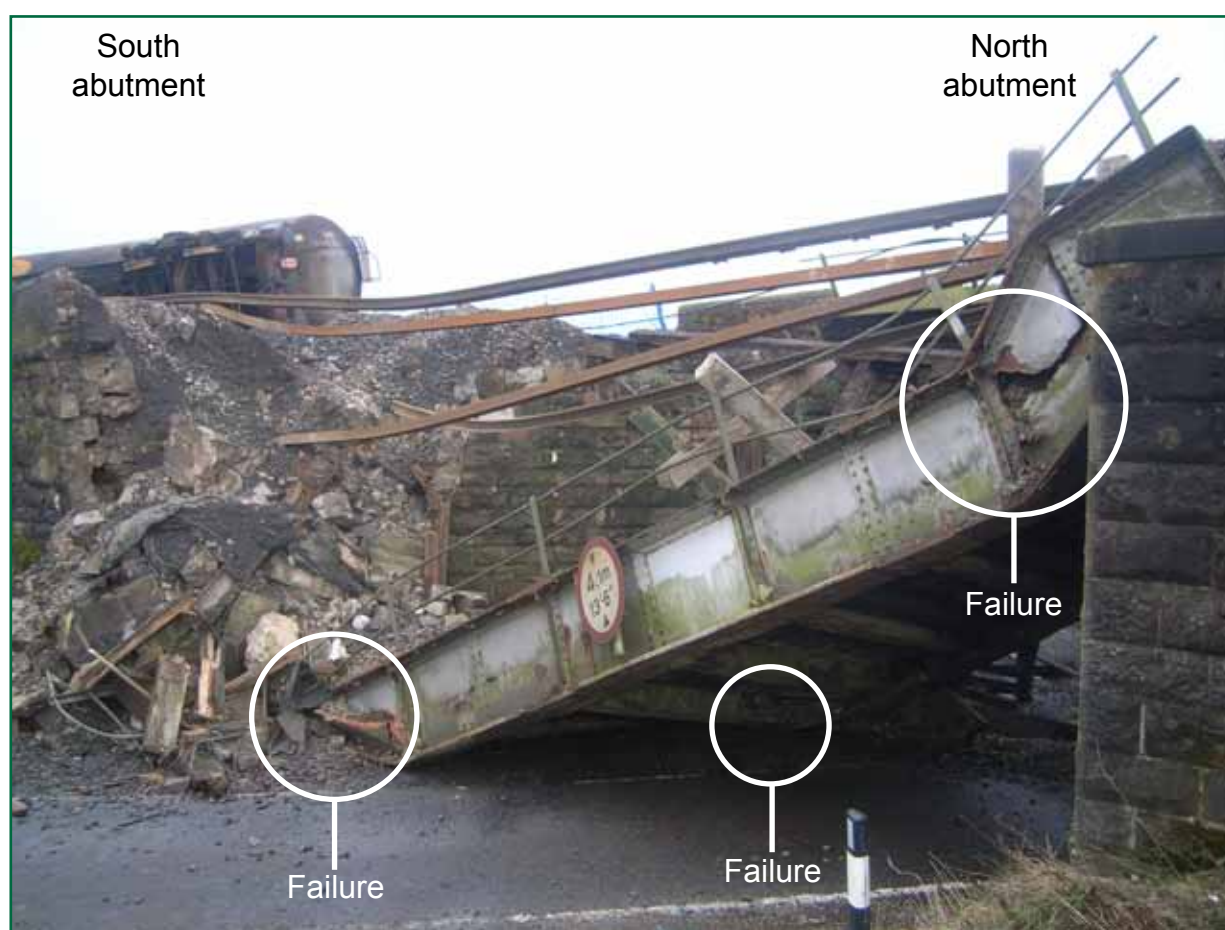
Bridge 88 after the derailment - east side (reflective yellow and black hatching road sign has been removed to reveal the condition of the east main girder)
